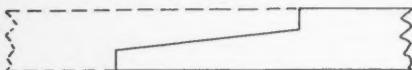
Drawing illustrating method of scarfing edge of deck plate for joint.
